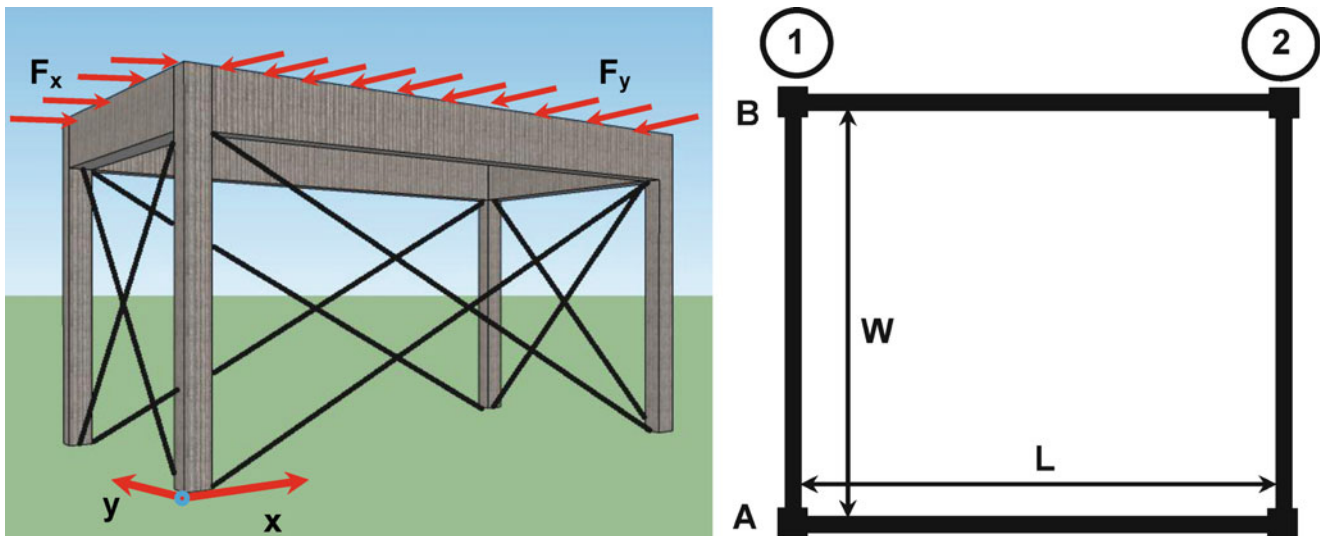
Basic prototype geometry and boundary conditions – left elevation, right plan view
